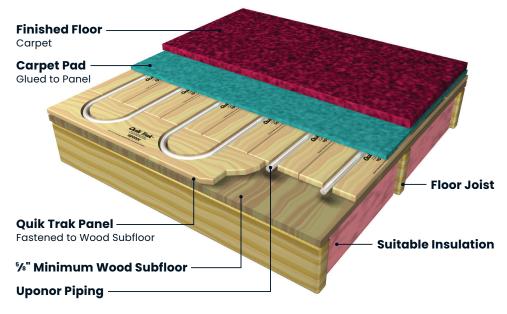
Quik Trak over a wood subfloor with carpet floor covering
